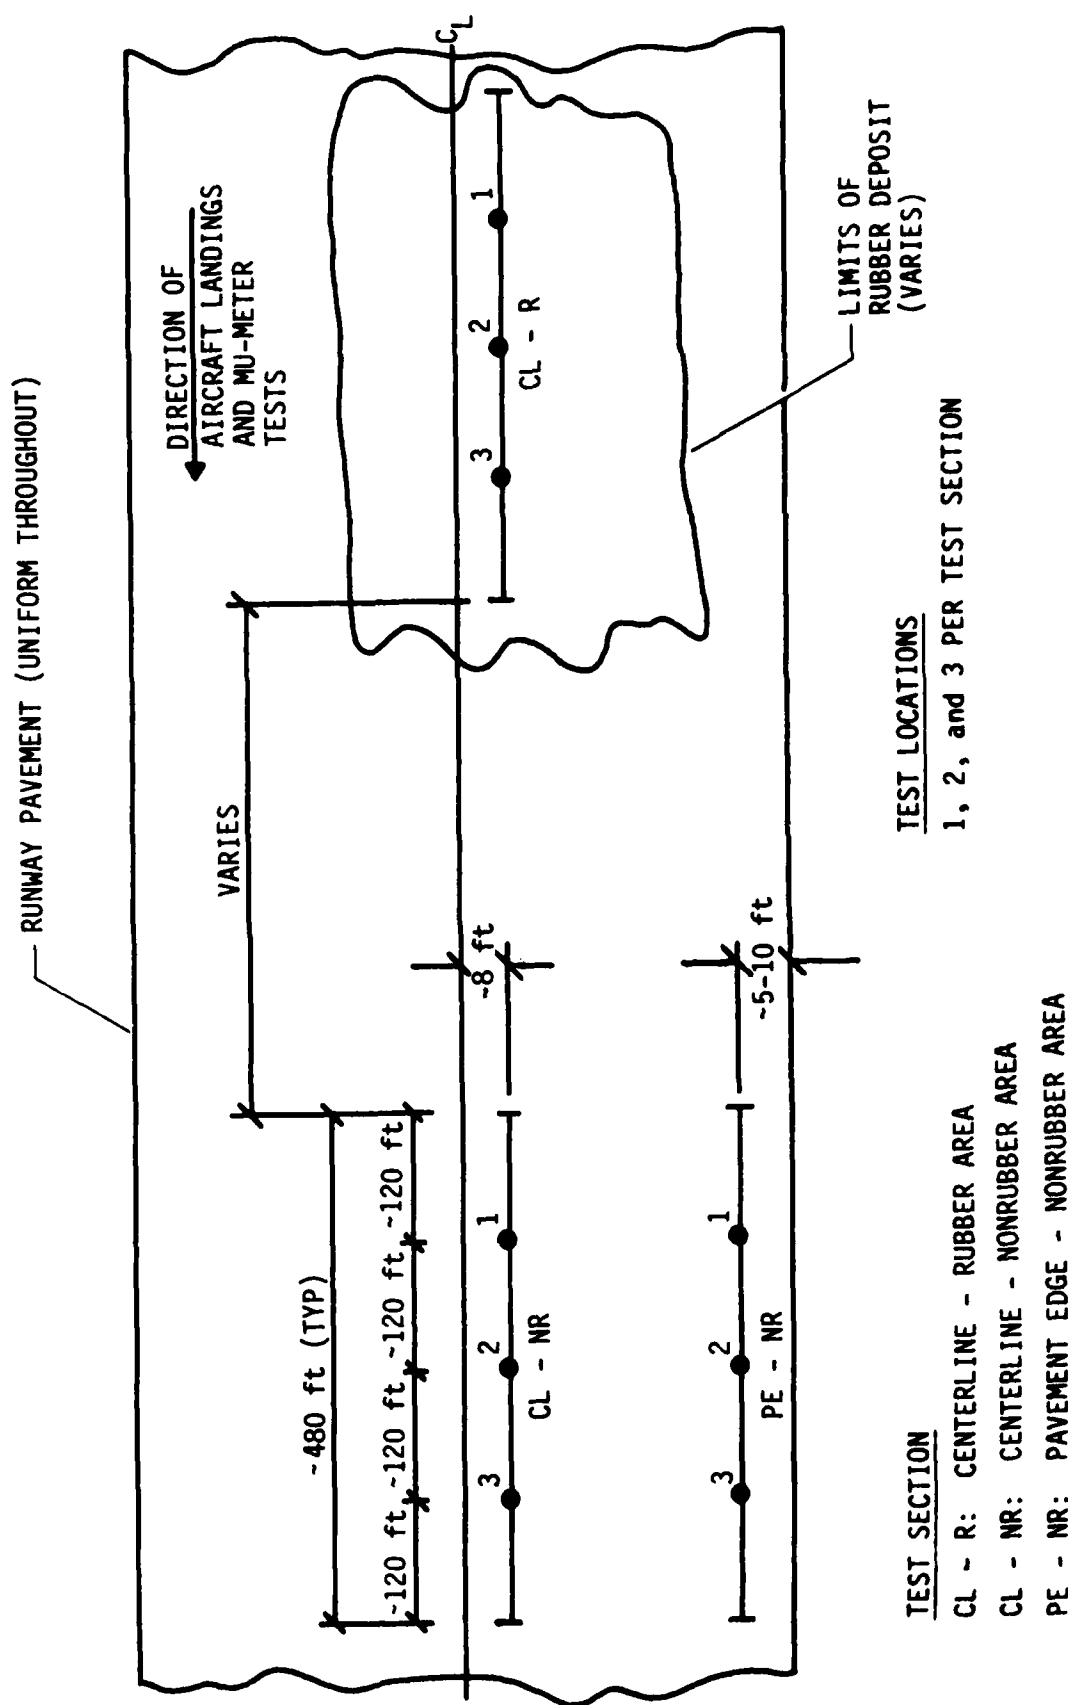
TYPICAL TEST SECTION LAYOUT (REFERENCE 3)
